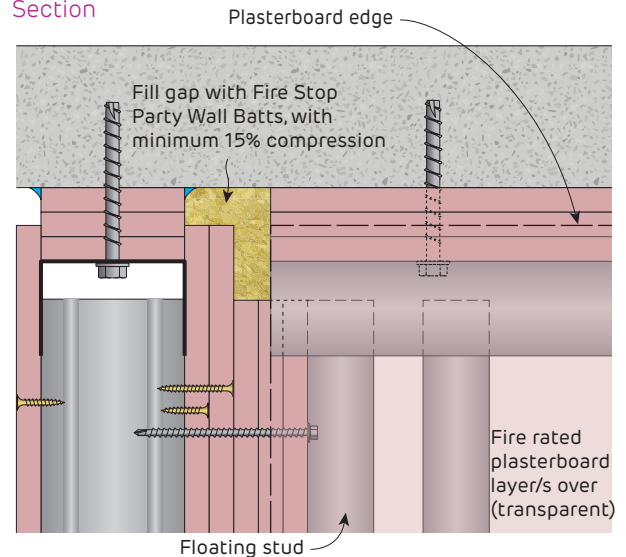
Sliding Wall End To Plasterboard Elevation to Figure 141
